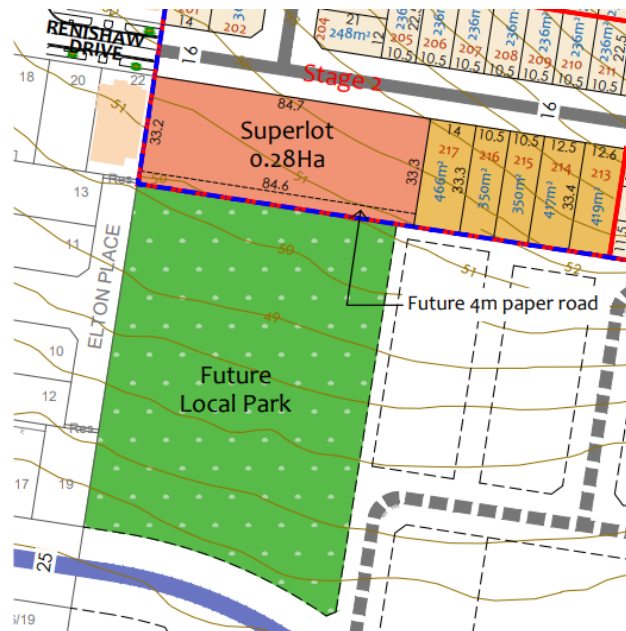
Extract of Subdivision Masterplan, showing future local park to the south
